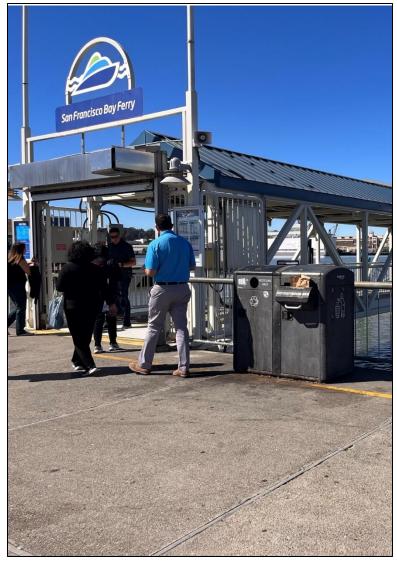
Existing ferry terminal infrastructure and walkways. Photo taken on July 25, 2023 facing southwest.
